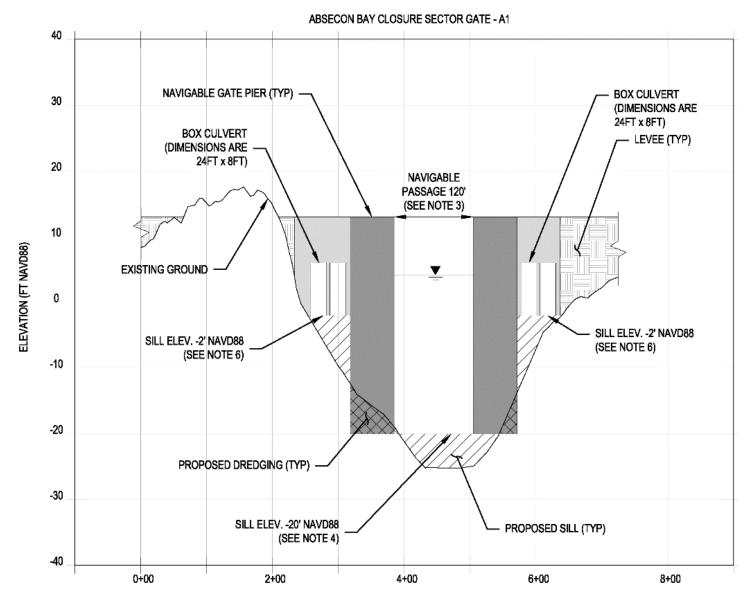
Absecon Blvd. Cross-Bay Barrier (Bay Closure) A-1 Navigable Gate Cross Section
